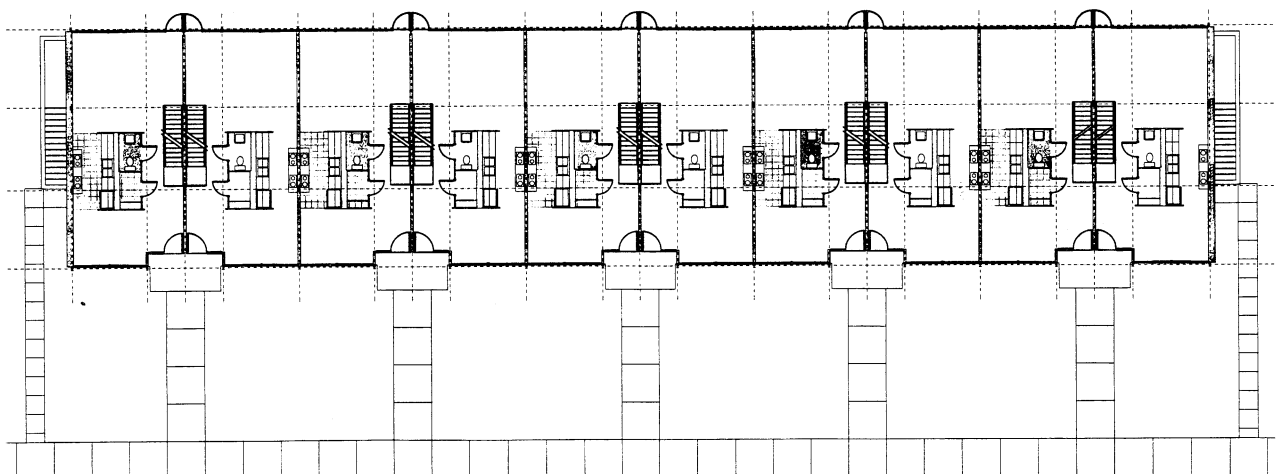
Townhouse Building: Ground Floor (Ten Units)
